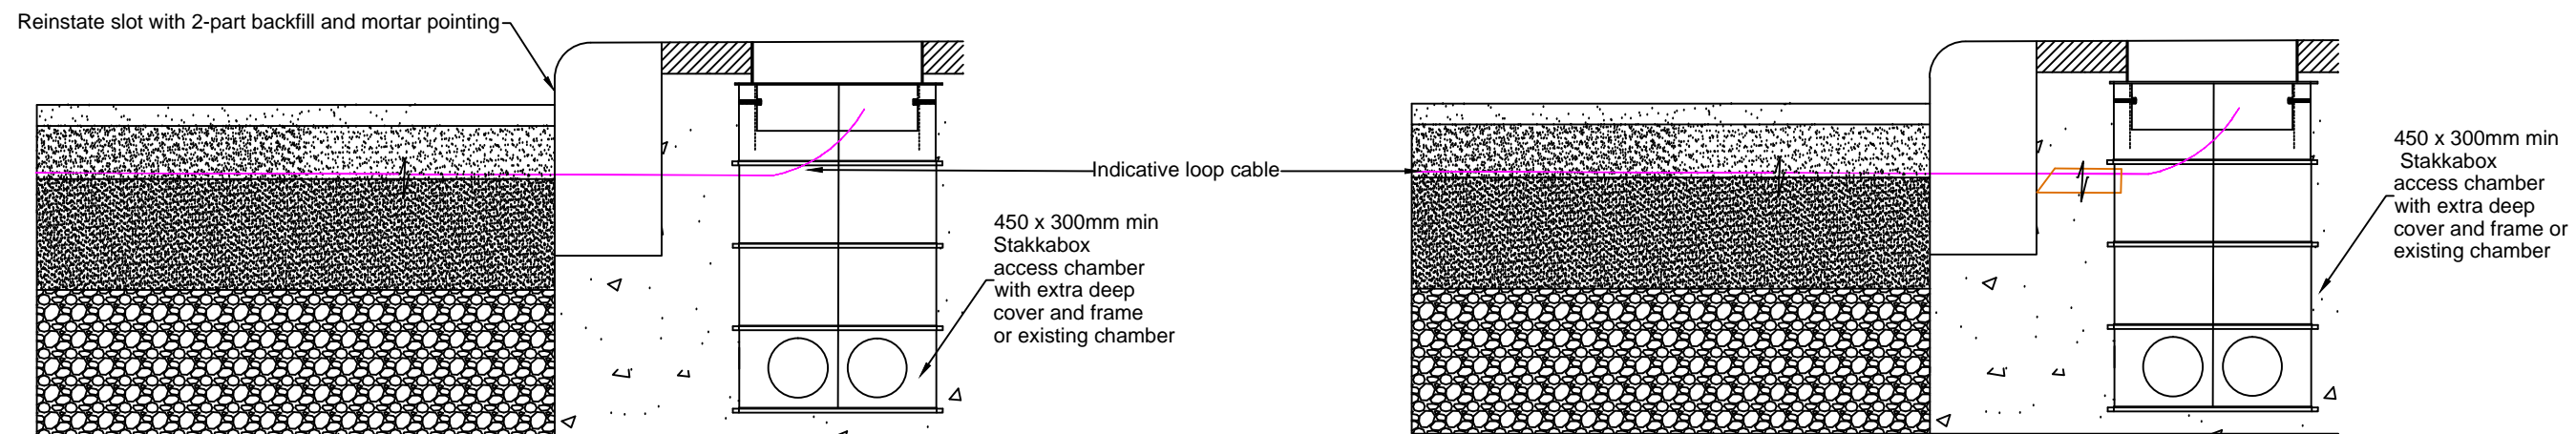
Installation of Carriageway Loop Box Offset from Kerb
